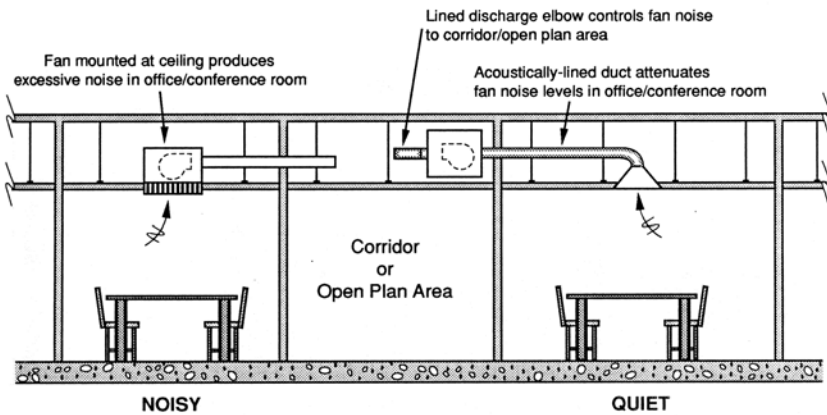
Noisy and quiet installations of ceiling-mounted exhaust fans.
